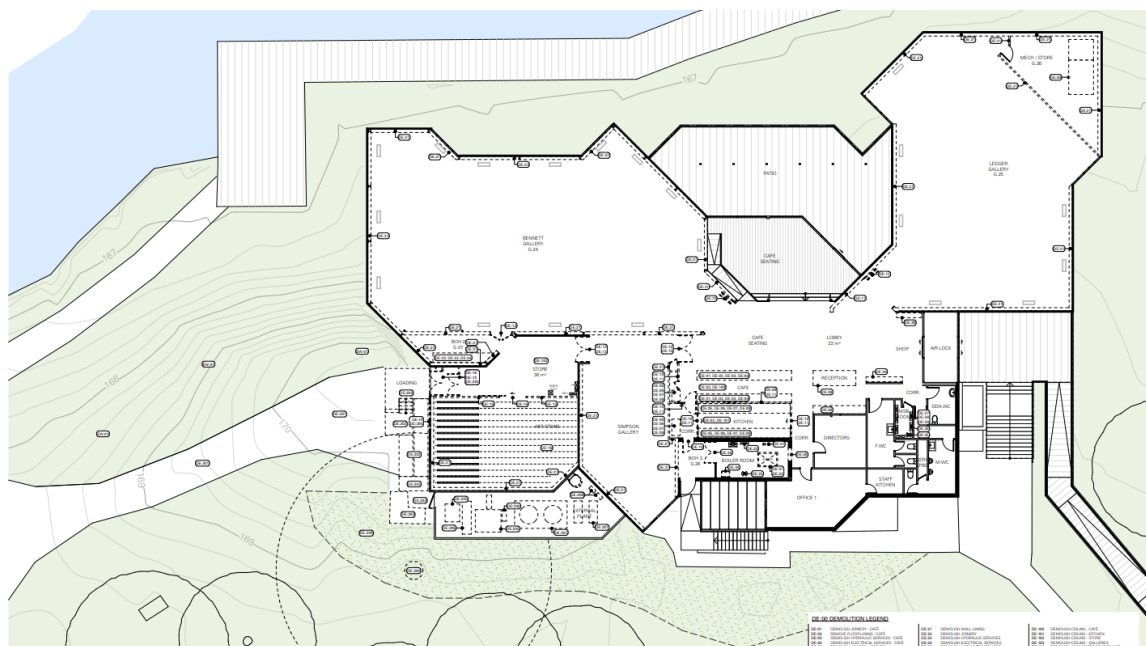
Ground floor existing and demolition plan (shown dashed). Source: WBa, April 2025.
